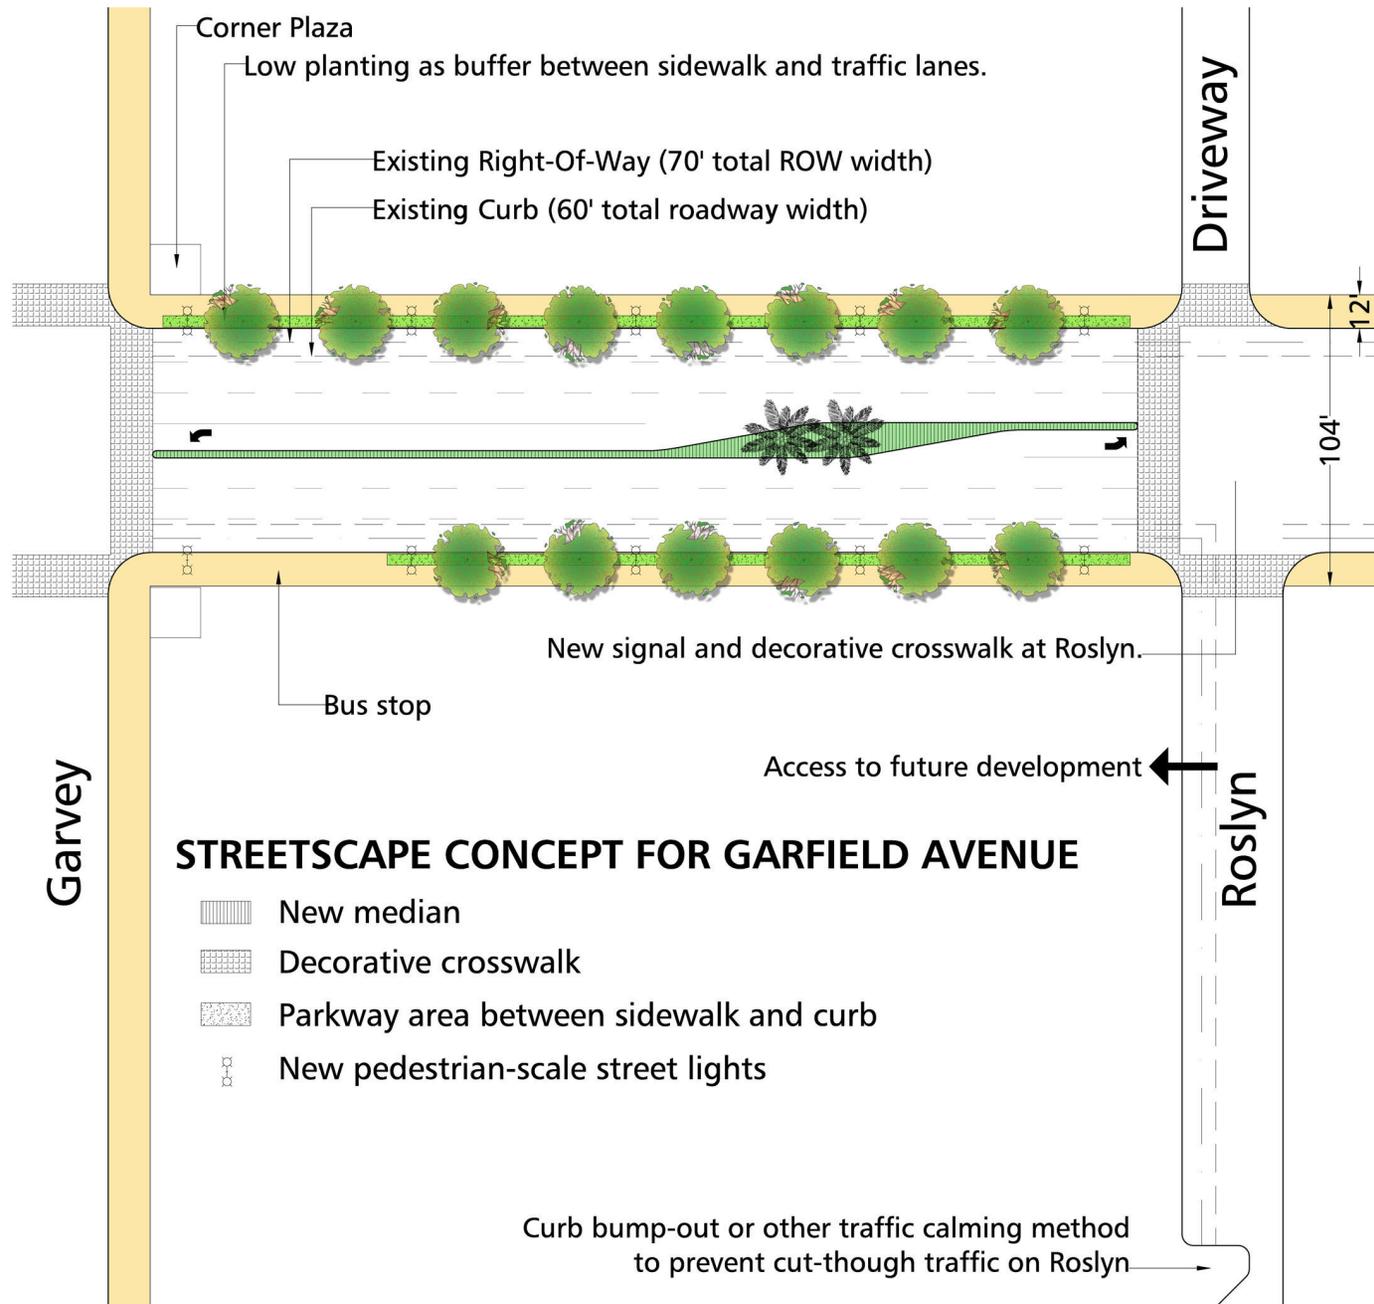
Streetscape plan for Garfield Avenue south of Garvey Avenue.
